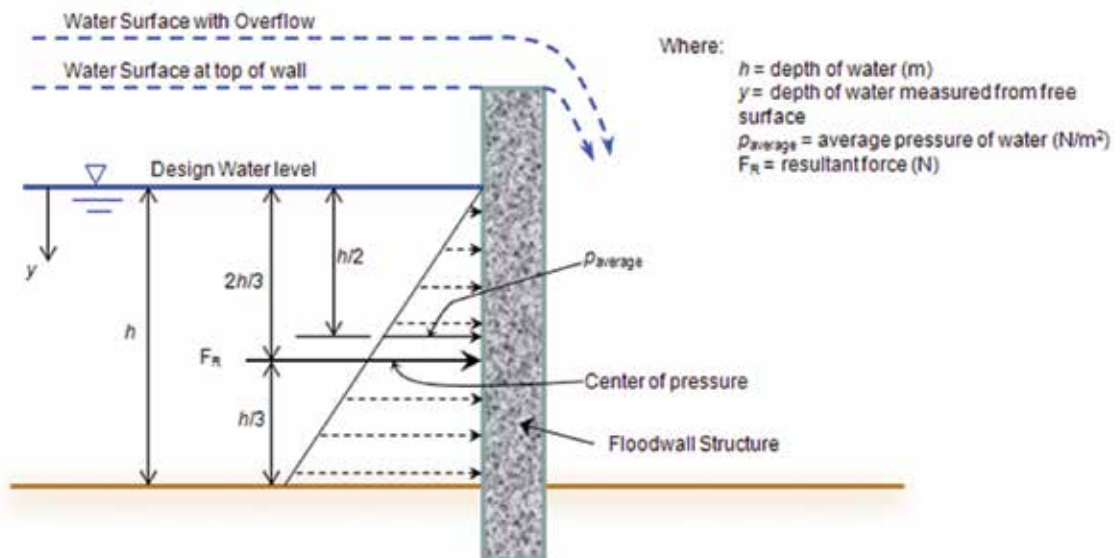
Hydrostatic pressure acting on vertical flood wall
